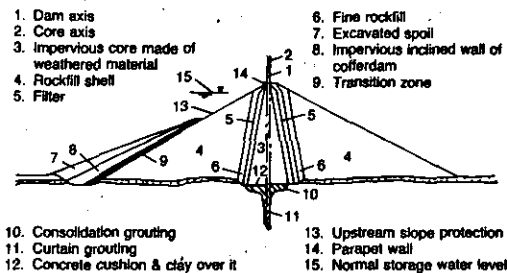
A cross section of the Lubuge earth & rockfill dam
